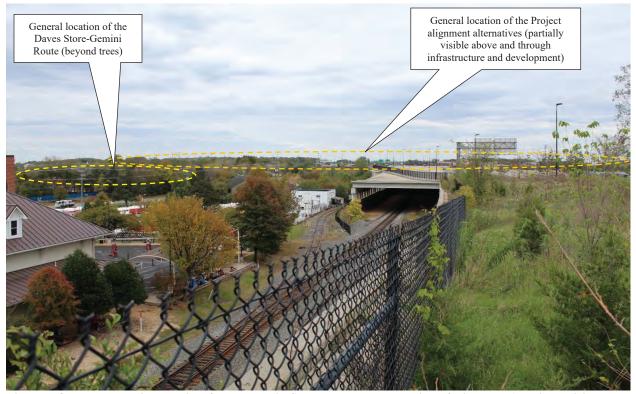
Photo location 5- View from W Main Street towards the Project, facing east (Partially visible above and amongst other infrastructure and development).
